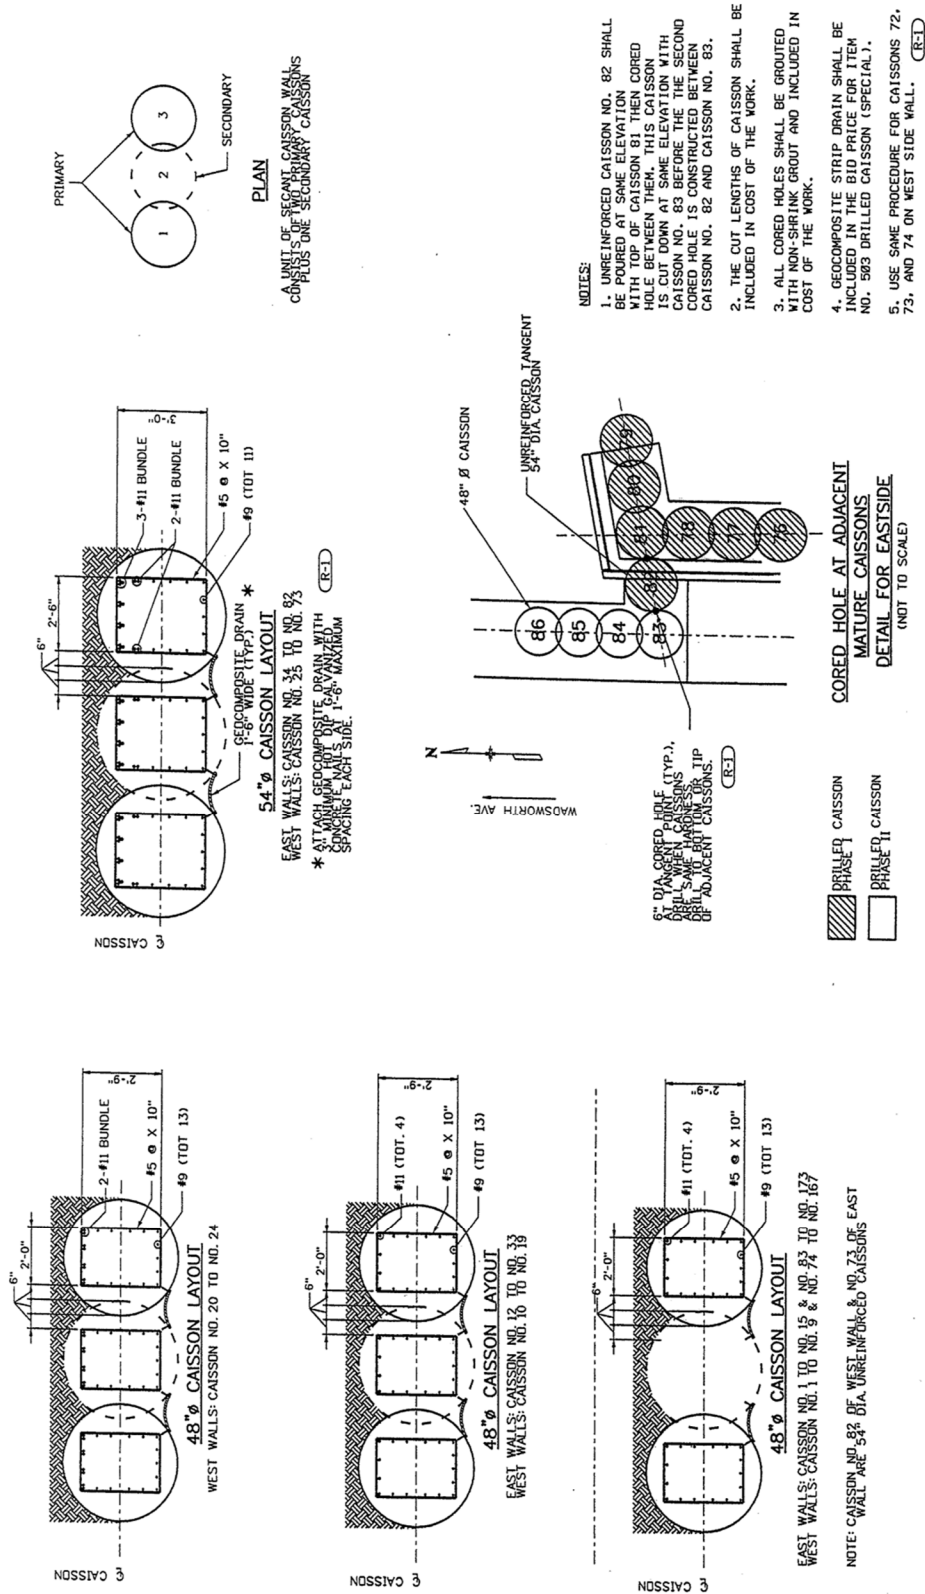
Secant Caisson Wall Details Example
